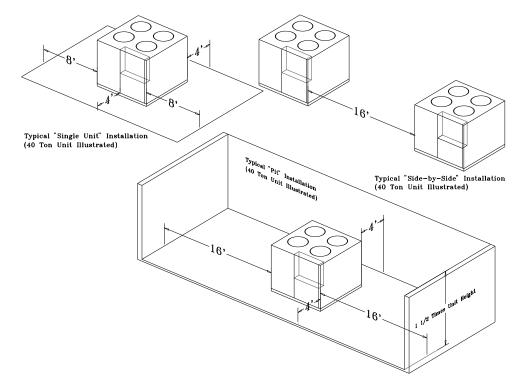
Typical installation clearances for single, multiple, or pit applications: 20-60 ton units
